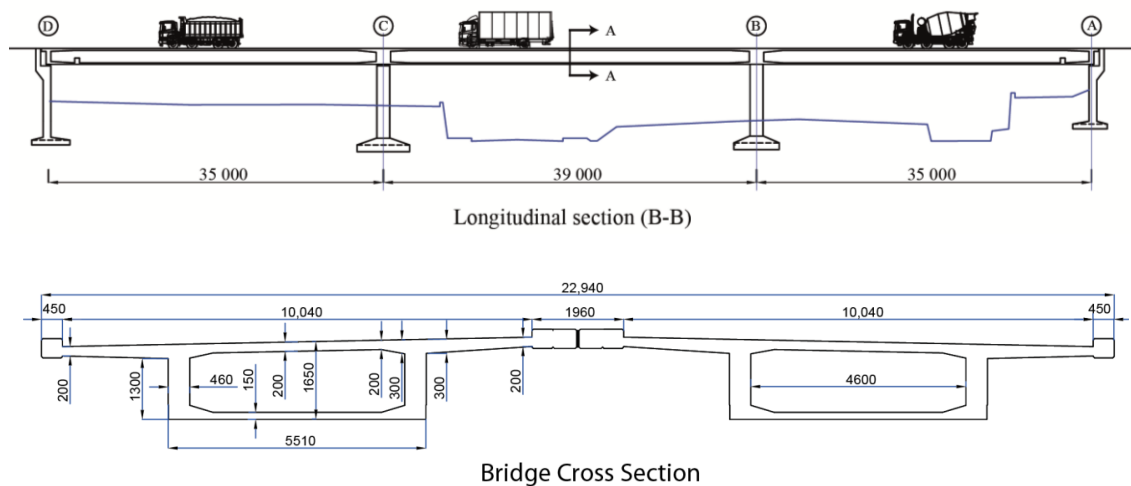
Side Elevation and Cross-section showing principal dimensions (in mm).
